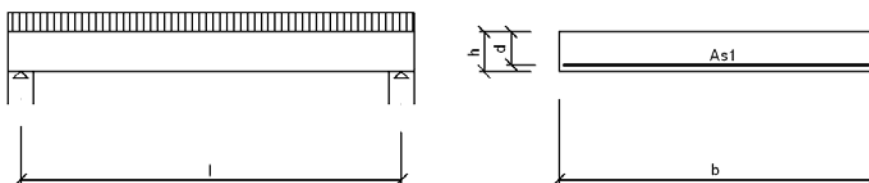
Scheme of simply supported reinforced concrete one-way slab
